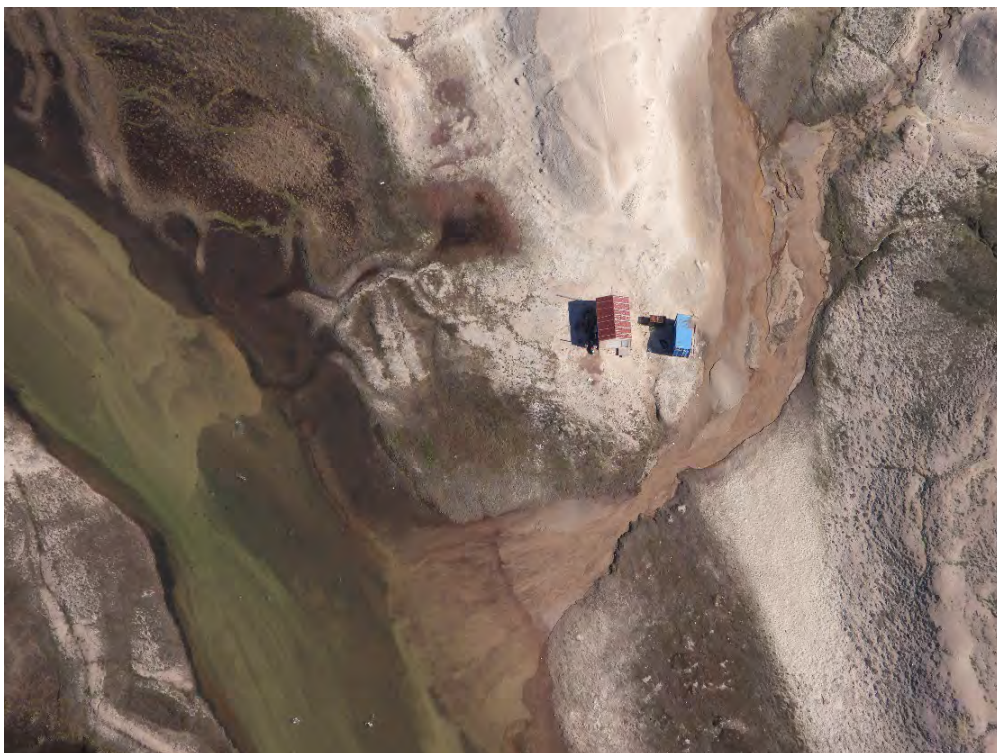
Aerial View of Warehouse Building and Laydown – September 2023
